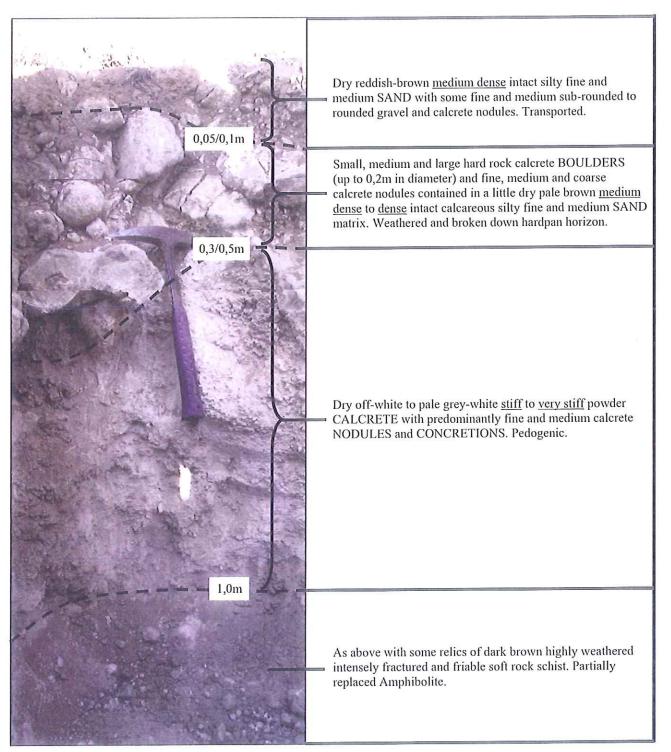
to 23 PHOTOS OF TEST PIT EXPOSURES DEPICTING SOIL PROFILES
